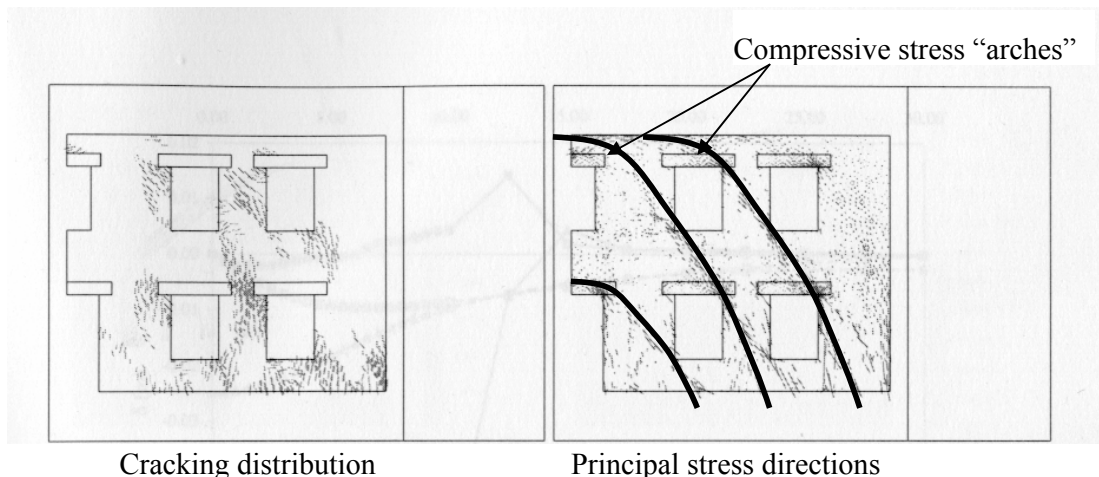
Cracking and arching behaviour of a masonry façade with openings (Liu, 1997)
